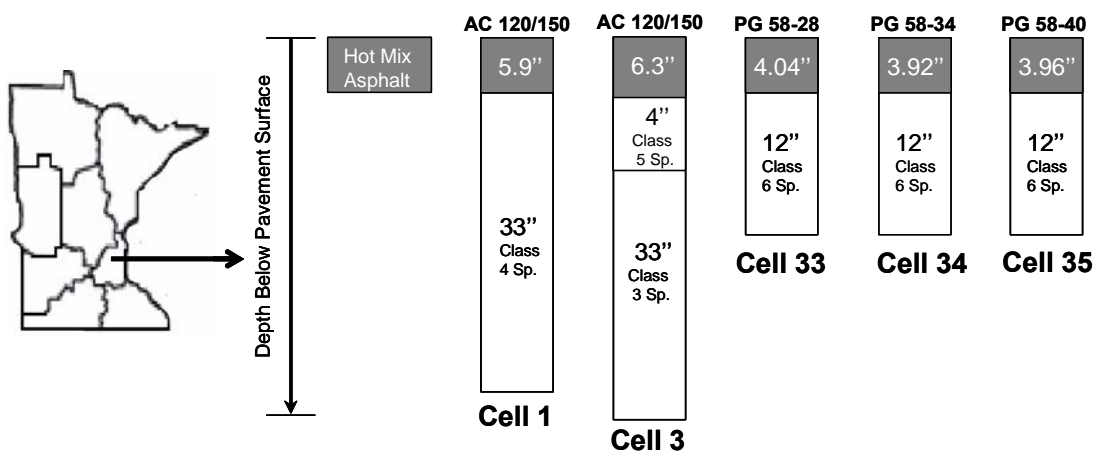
Pavement Layer Details for the MnRoad Cores
